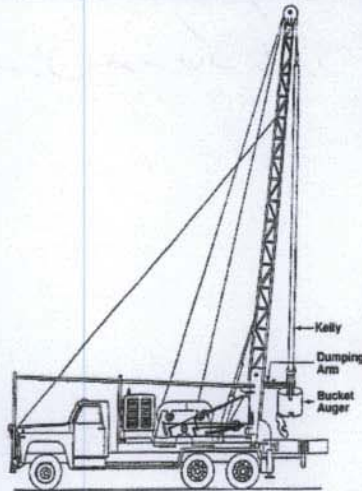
Setup of Bucket Auger & Rig (from ASTM D 4700)
